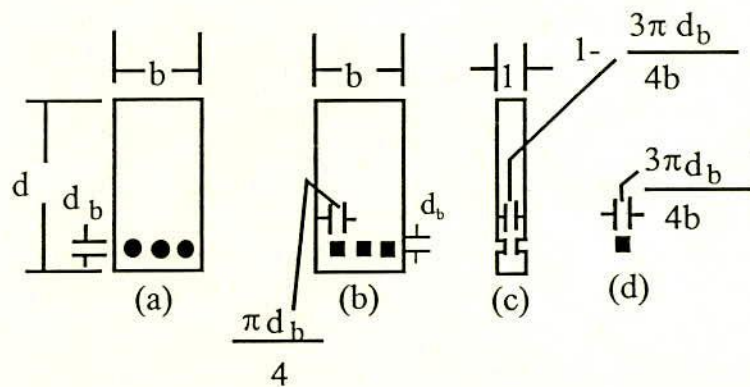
Basis of Finite Element Model for Reinforced Concrete Beam. (a) Beam cross section. (b) Round bar has been replaced by equivalent rectangular bar. (c) Unit width of beam for plane stress idealisation. (d) Bar area tributary to a unit width of concrete
